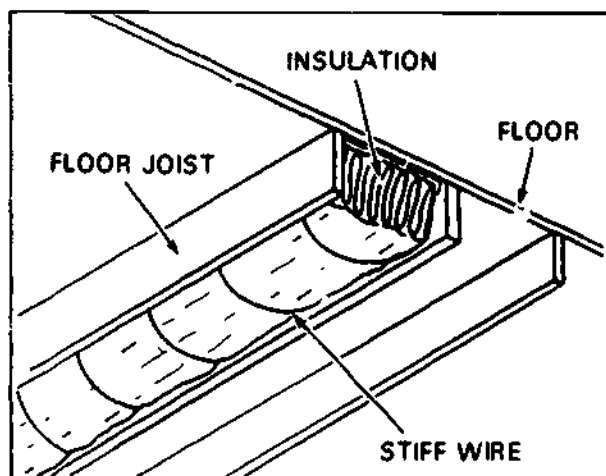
Stiff wire may be used to support flexible insulation between floor joists.
